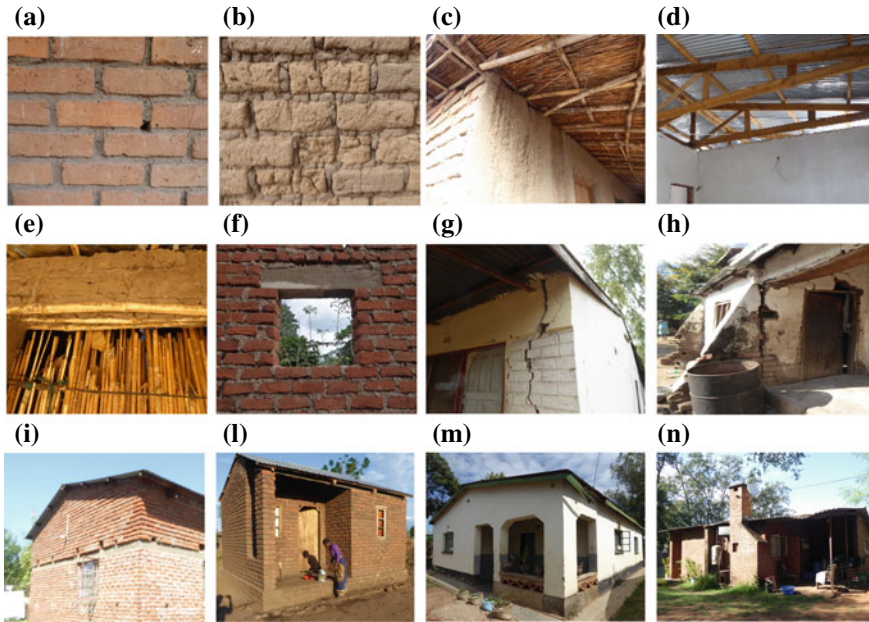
Typical buildings in Malawi a fired bricks with cement mortar; b mud bricks with mud mortar; c thatched roof, d light metallic sheets supported by timber rafters, showing a lack of connection between walls and roof, and absence of both wall plates and ring beams; e bamboo lintel; f concrete lintel, g house with poor connection between walls; h lack of connection between buttress and wall; i concrete ring beam; l re-entrant corner; m portico; n chimney
